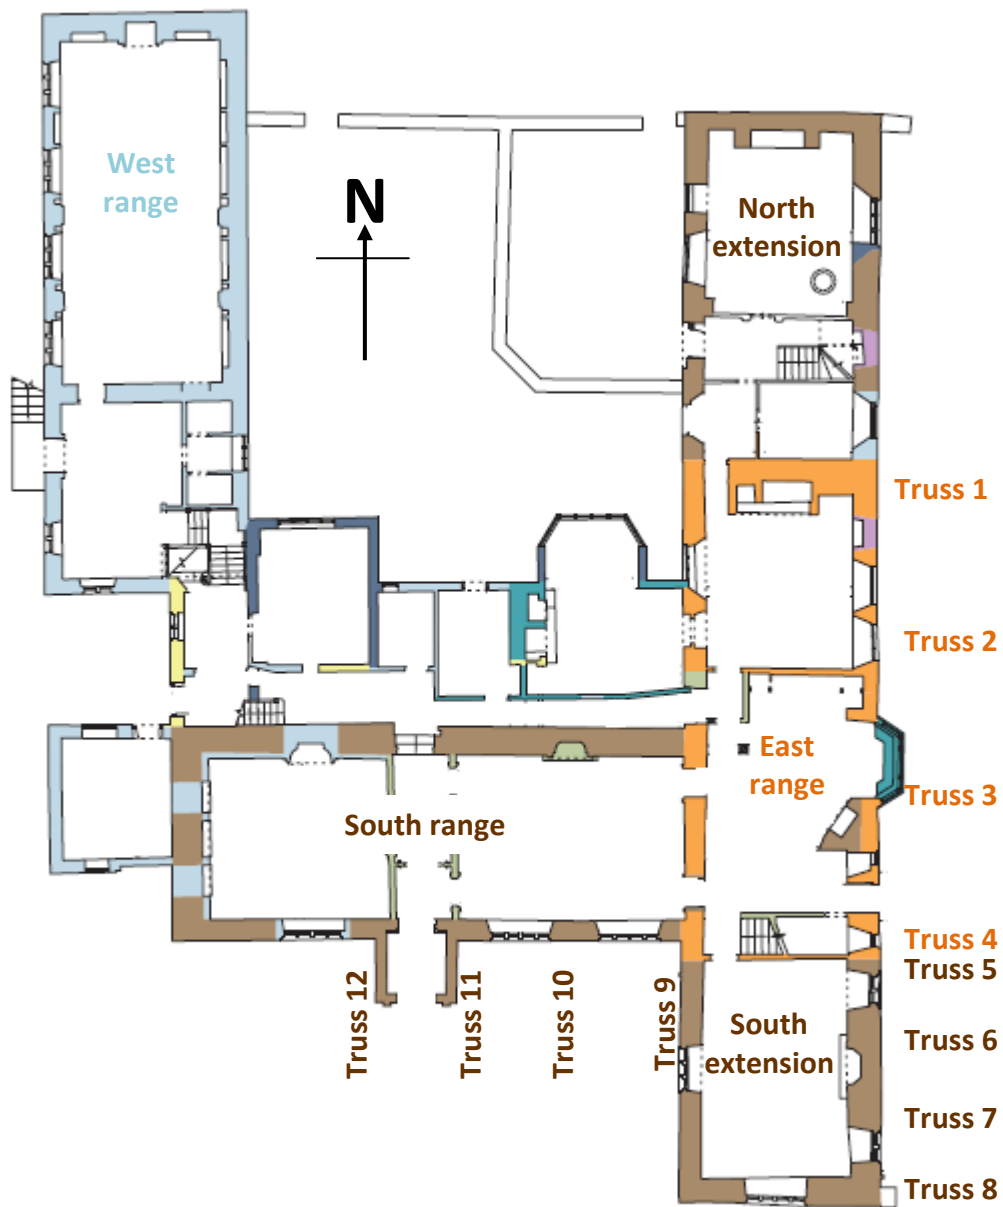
Plan of Avebury Manor to show layout and arrangement of the various ranges and the approximate position of the roof trusses (after Wessex Archaeology)
